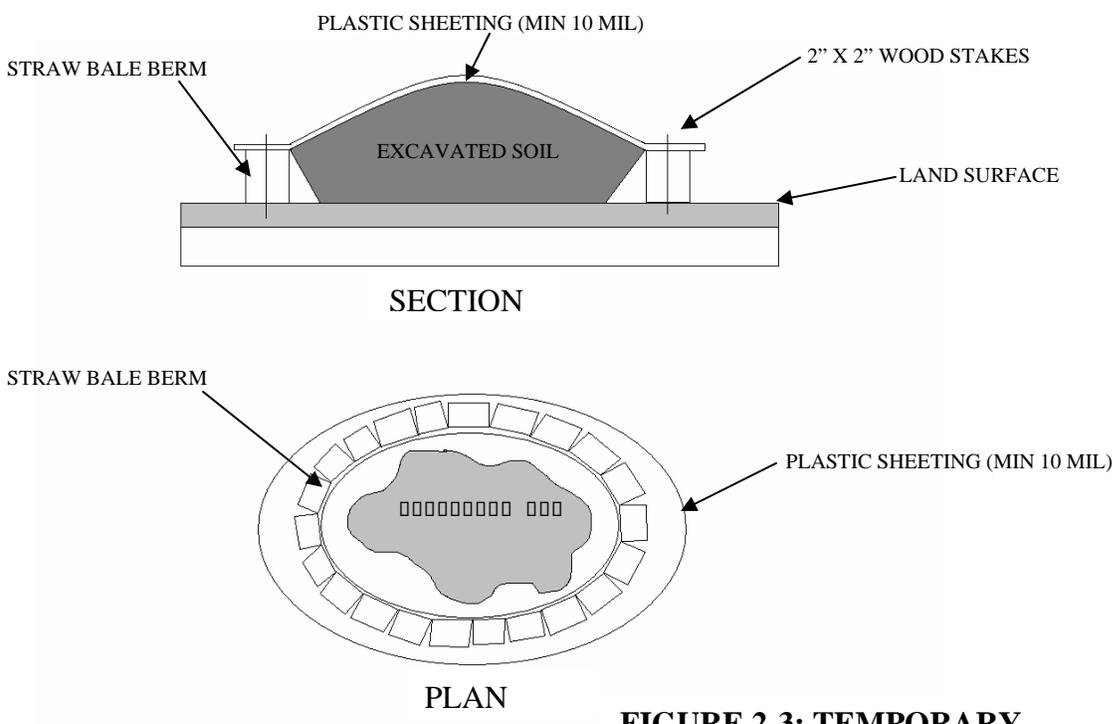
TEMPORARY CONTAINMENT OF EXCAVATED SOIL
